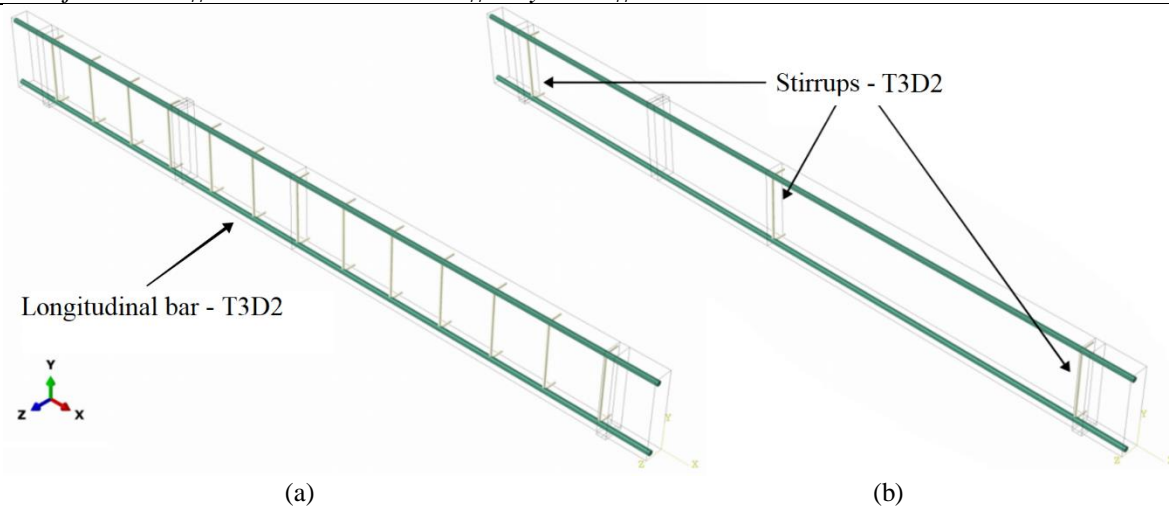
RC beam (V0-E) with stirrups (a) and RC beam (V1-S) without stirrups (b).
